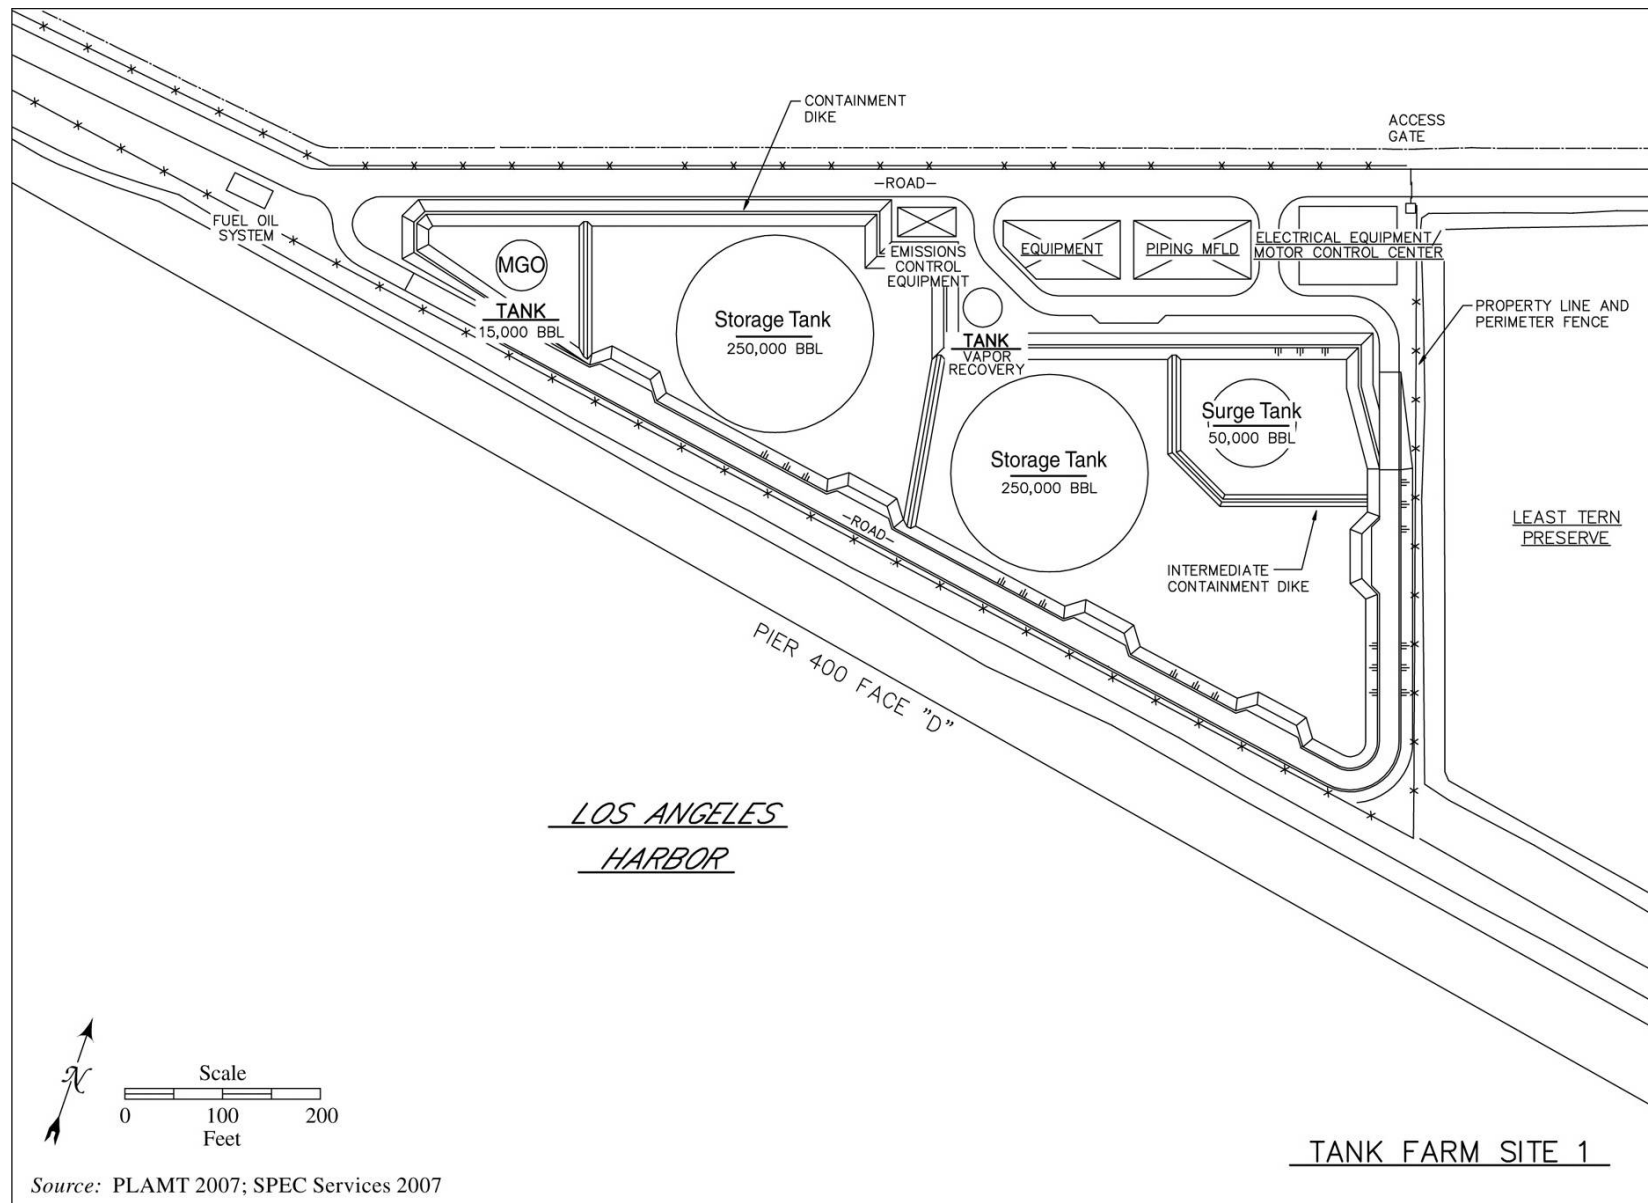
Proposed Tank Farm Site 1 (Pier 400 Tank Farm)
